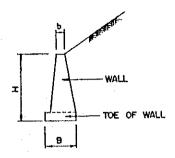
Configuration of Gravity-Type Retaining Wall
